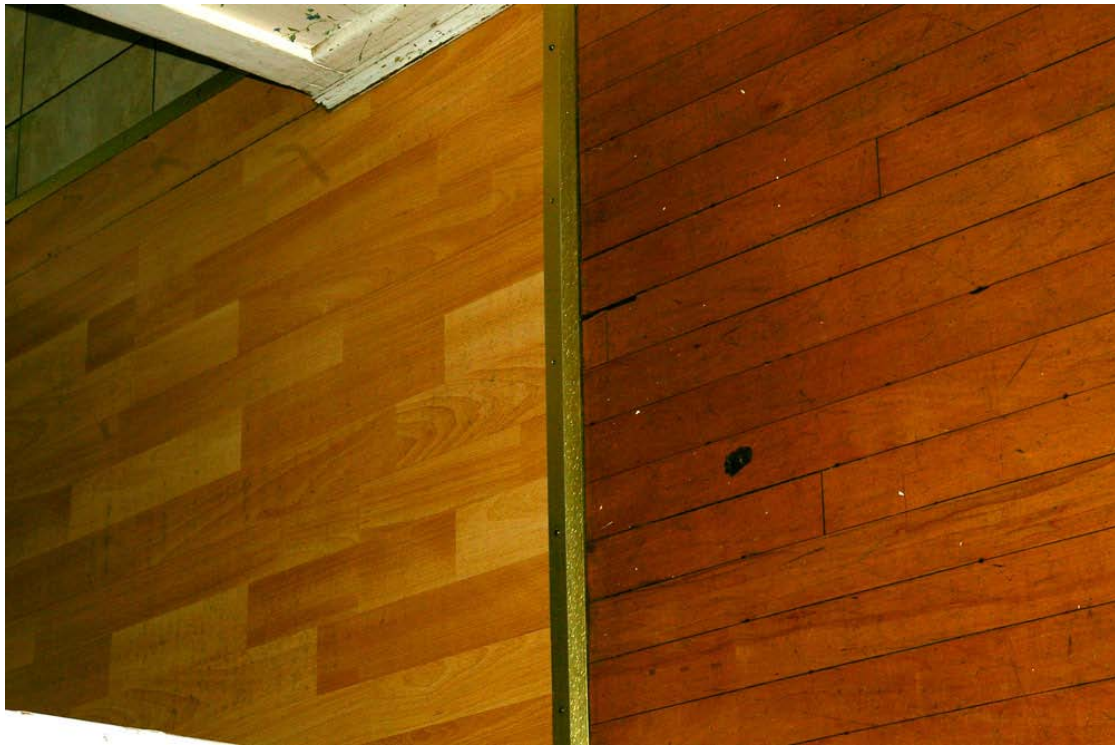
Detail of new laminate flooring in the living room and original oak flooring in the adjacent front bedroom.
